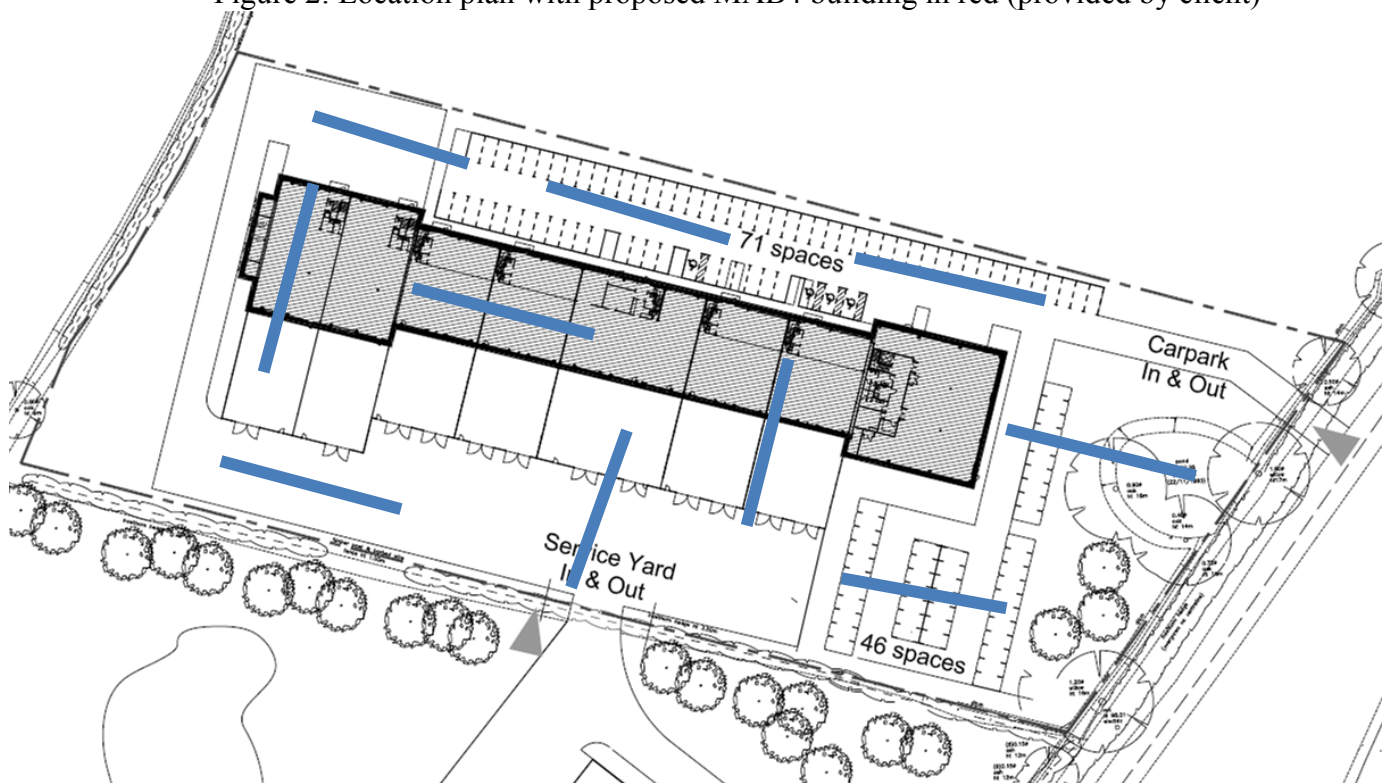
Proposed trench plan in relation to the proposed MAB4 building
